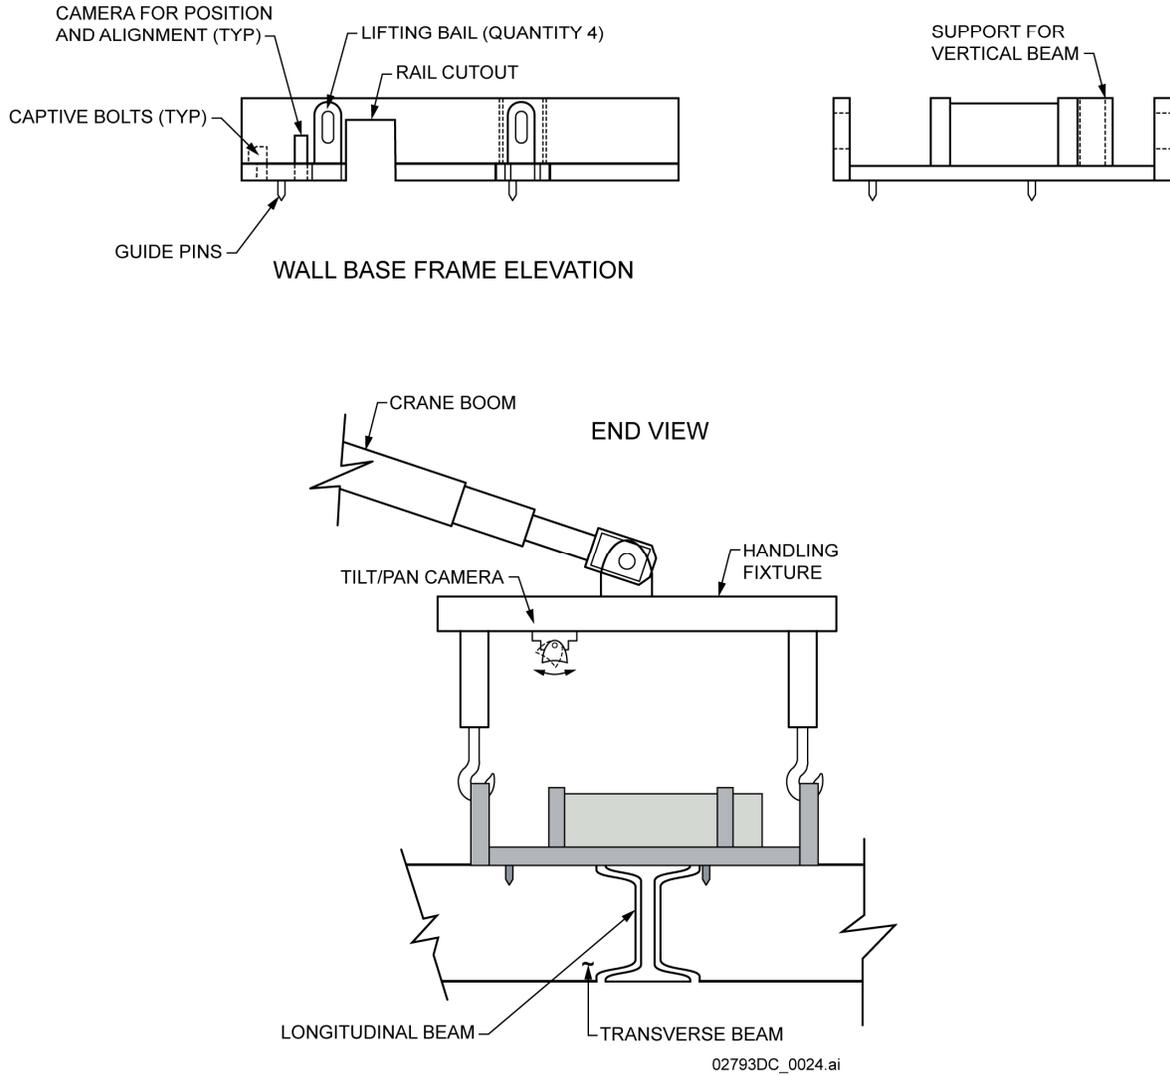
Step 1—Remote Placement of Wall Base Frame Using MRV
